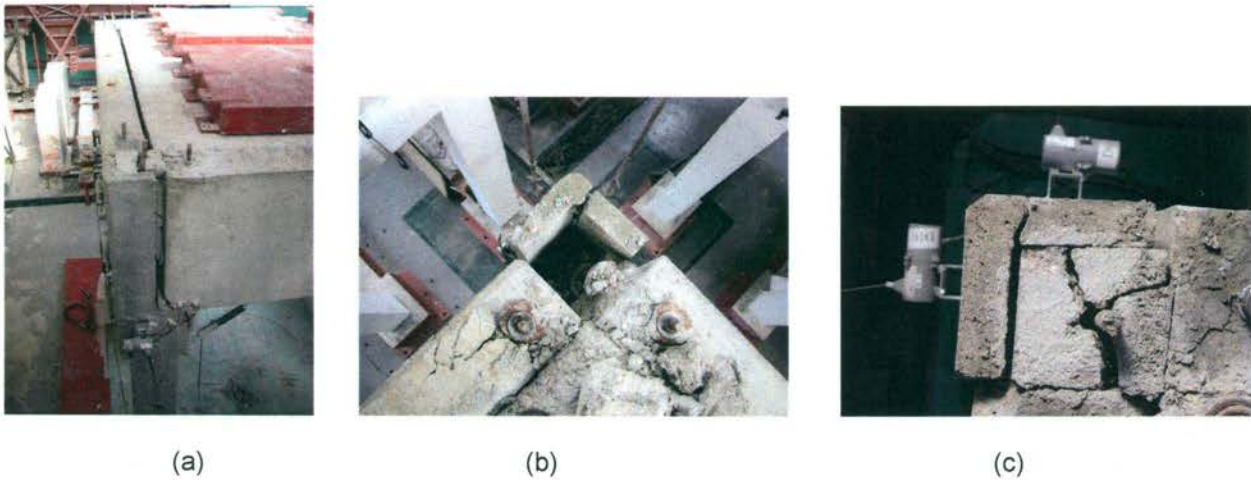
Typical damage to specimens 1, 2 and 3: (a) permanent torsional rotation of beams and damage to the corners due to impact with the column; (b) damage to the concrete surrounding the dowel and the column flanges; (c) damage to the in situ cast concrete. All specimens were subjected to a series of base excitations with pga up to approximately 0.5g.
